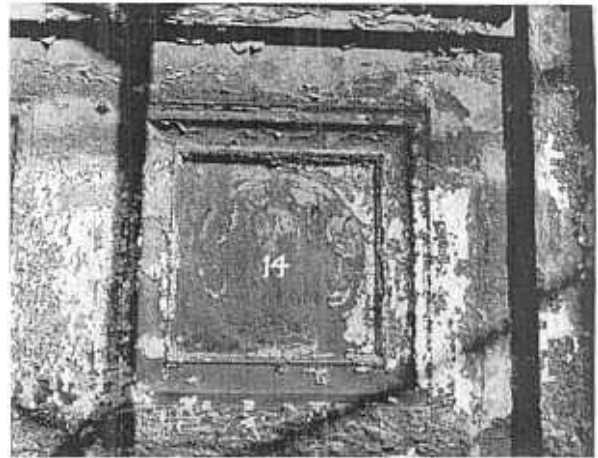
View of decorated panel plate with encircled starburst removed and small rivets for attaching same. (Photo: Author.)
